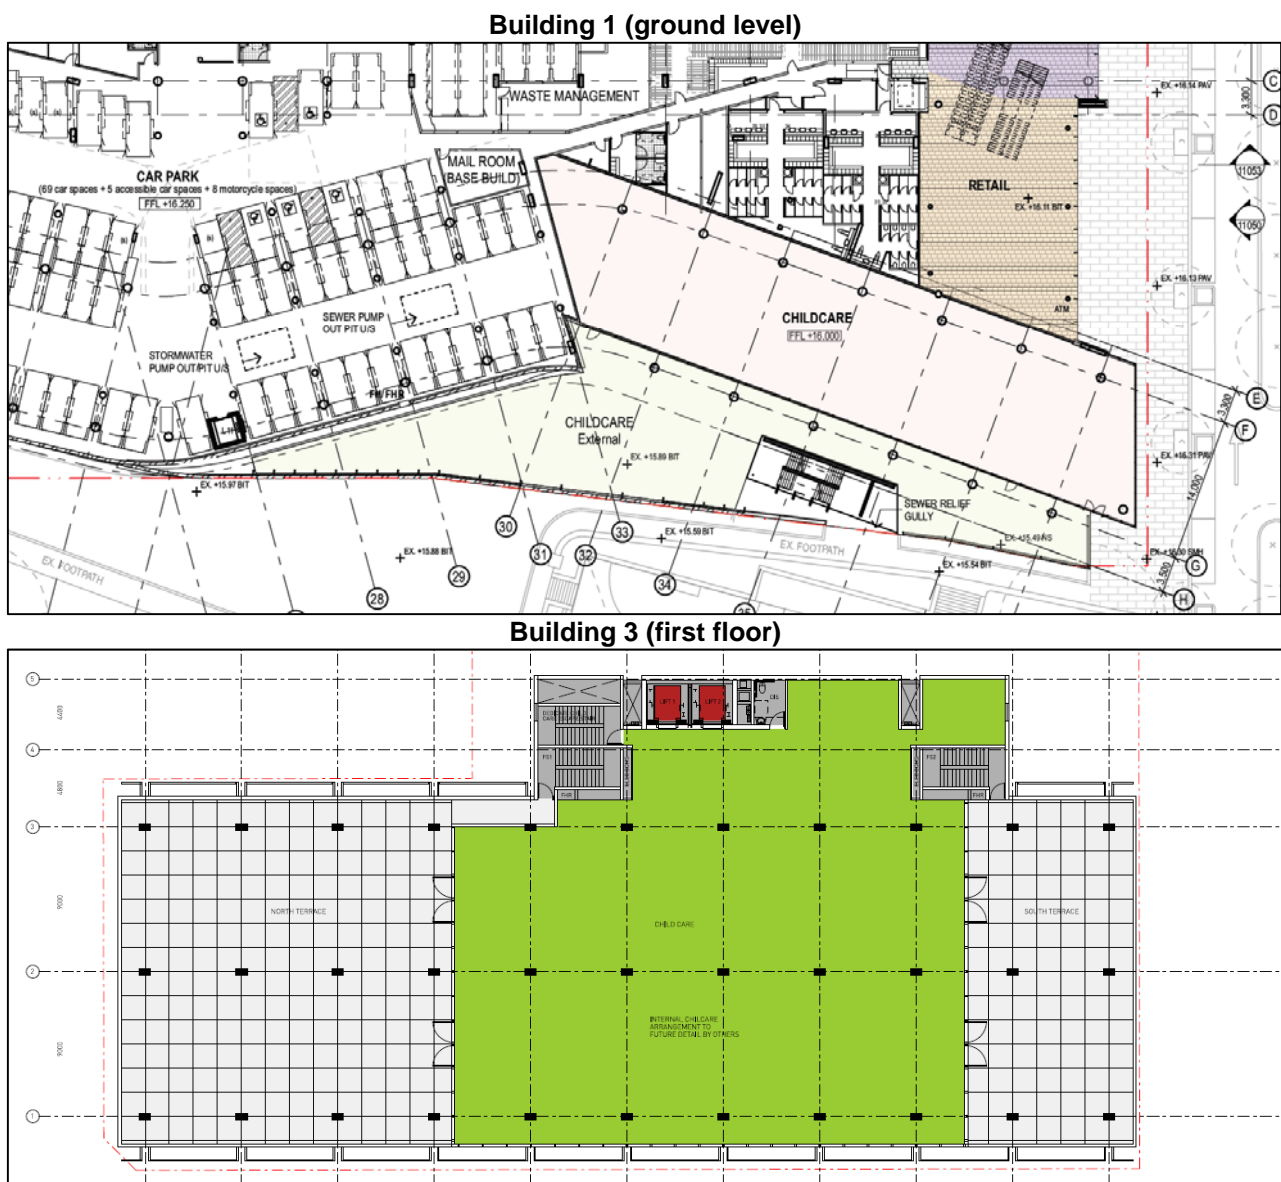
Extract of proposed child cares (source: applicant's RTS)
